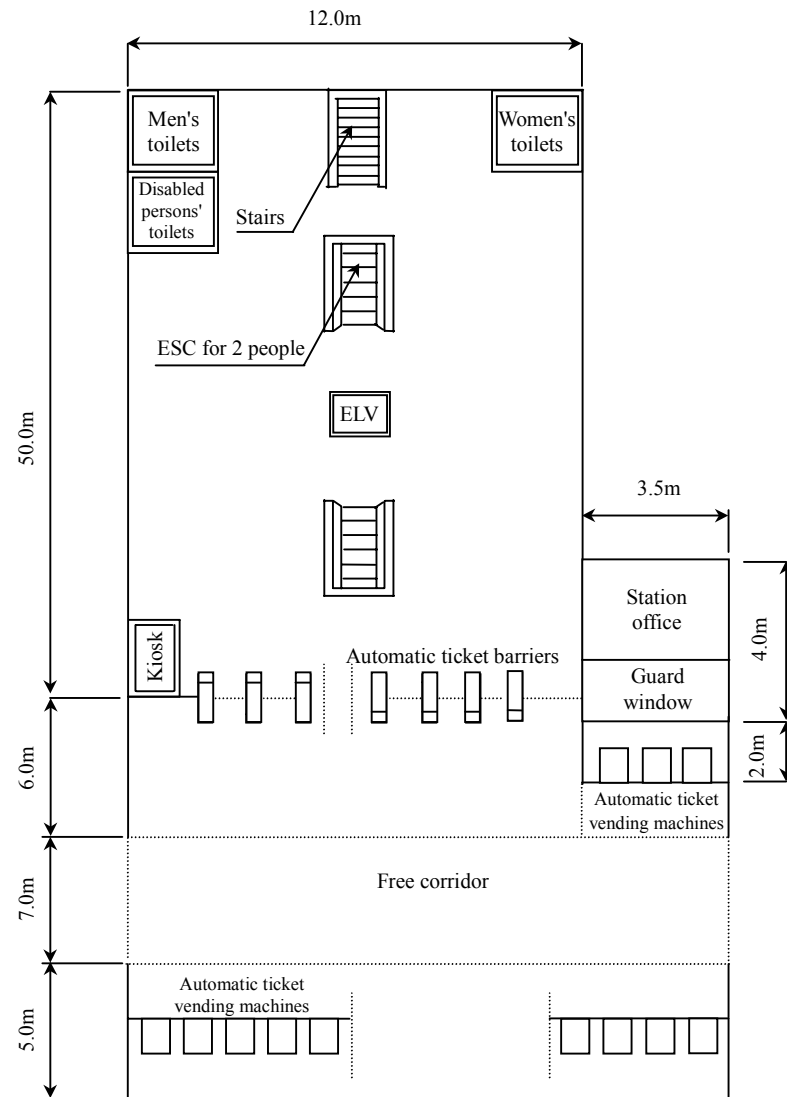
Preliminary Plan of Magallanes Station Facilities
